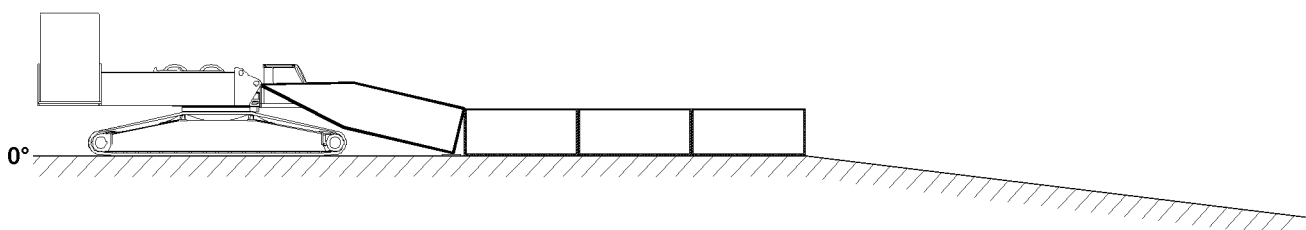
Disassembling and removing the boom - intermediate sections with the end section
